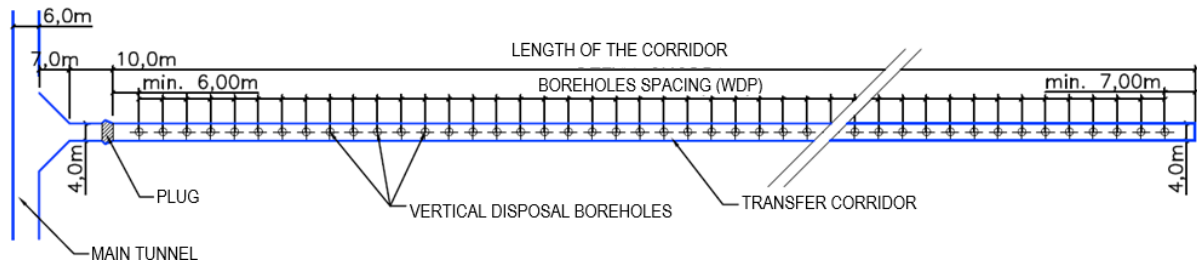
Schematic plan of vertical disposal, prevailing conventional excavation (D2 - VD, C) (Grunwald et al. 2018).
